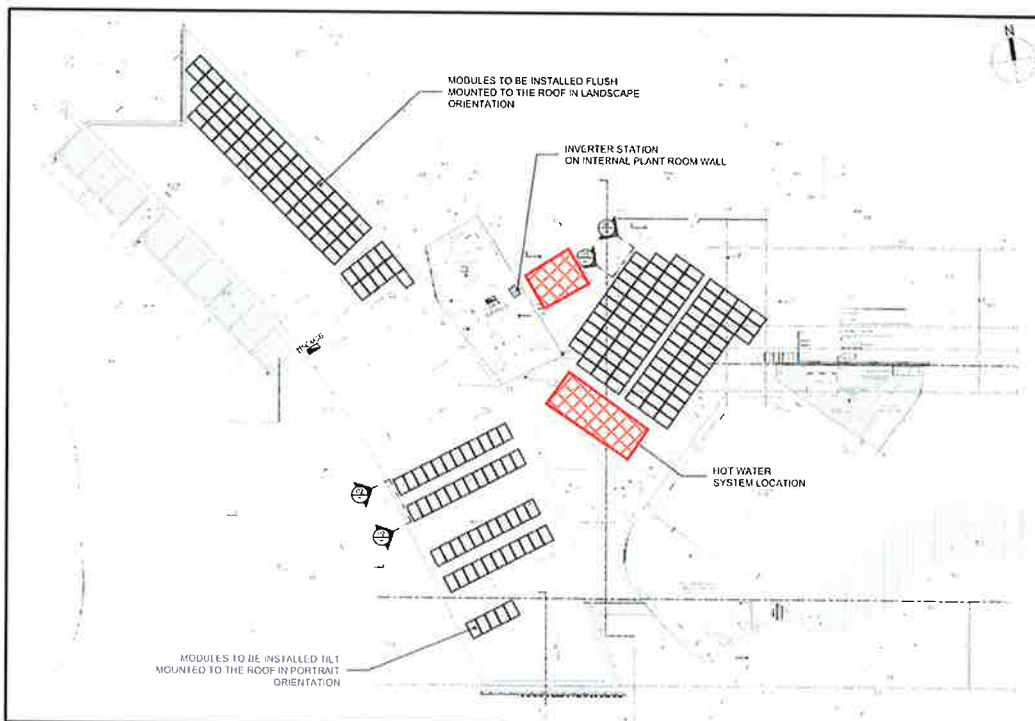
The proposed solar panels and already installed hot water panels (source: Applicant's EIS)
